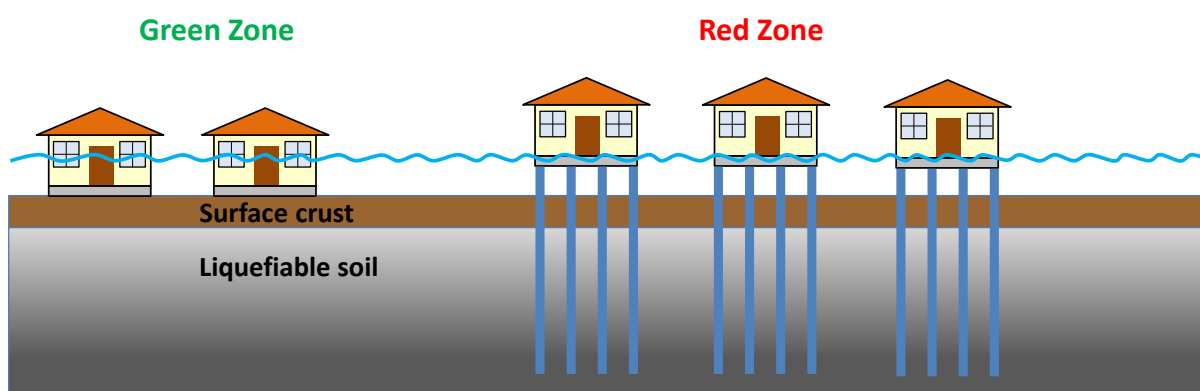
Concept 2 - Elevated dwellings with piled foundations. Light blue line is 200 year flood level.
